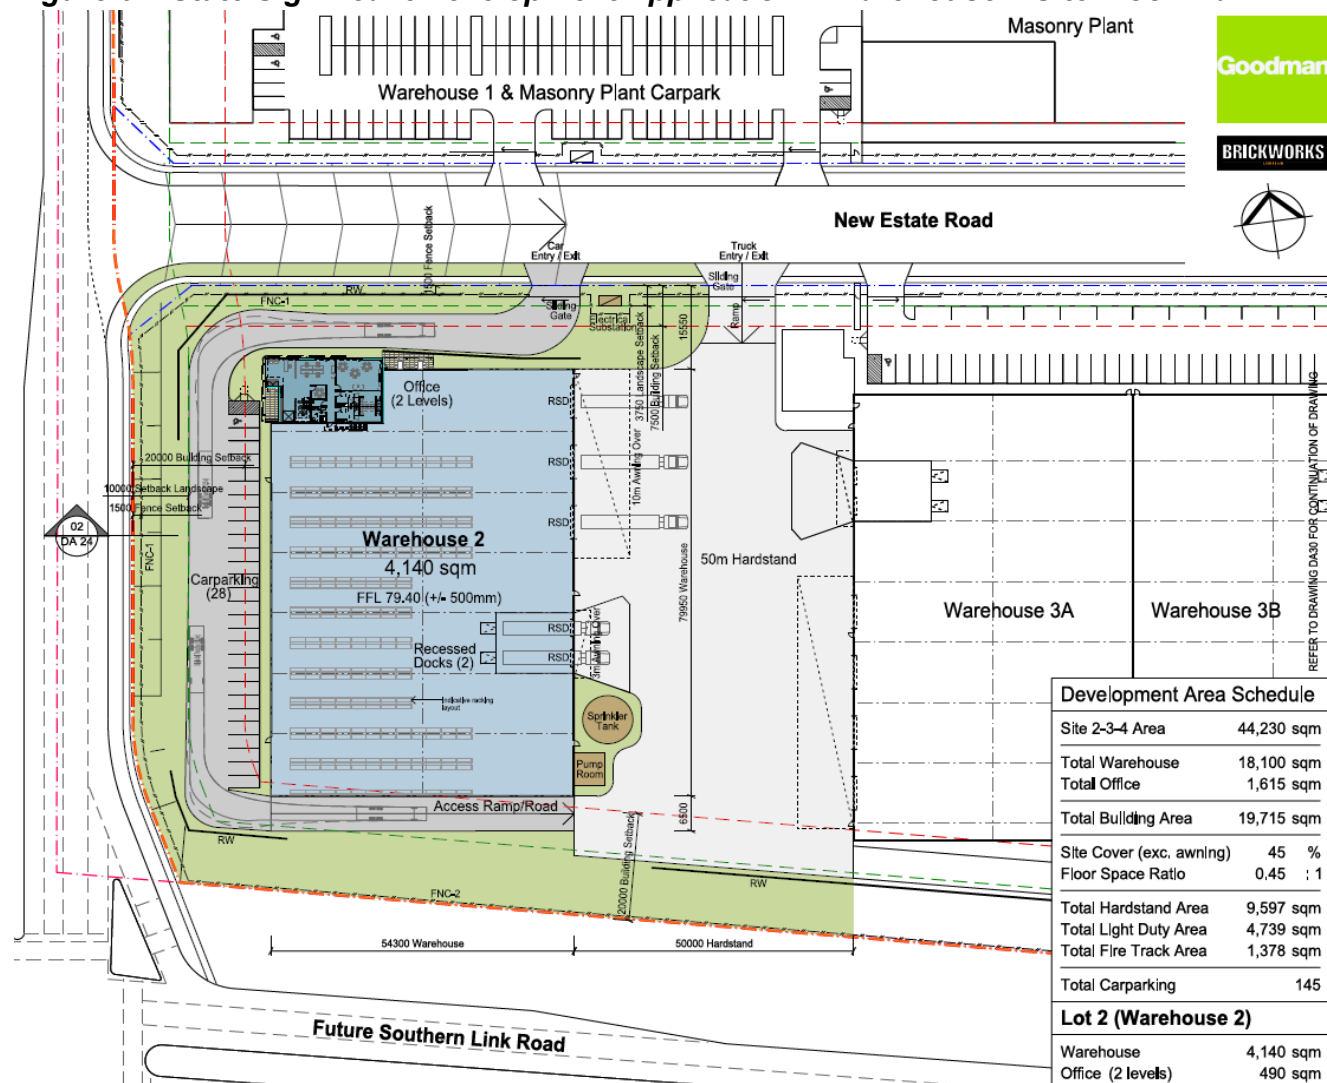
State Significant Development Application – Warehouse 2 Site/Floor Plan
